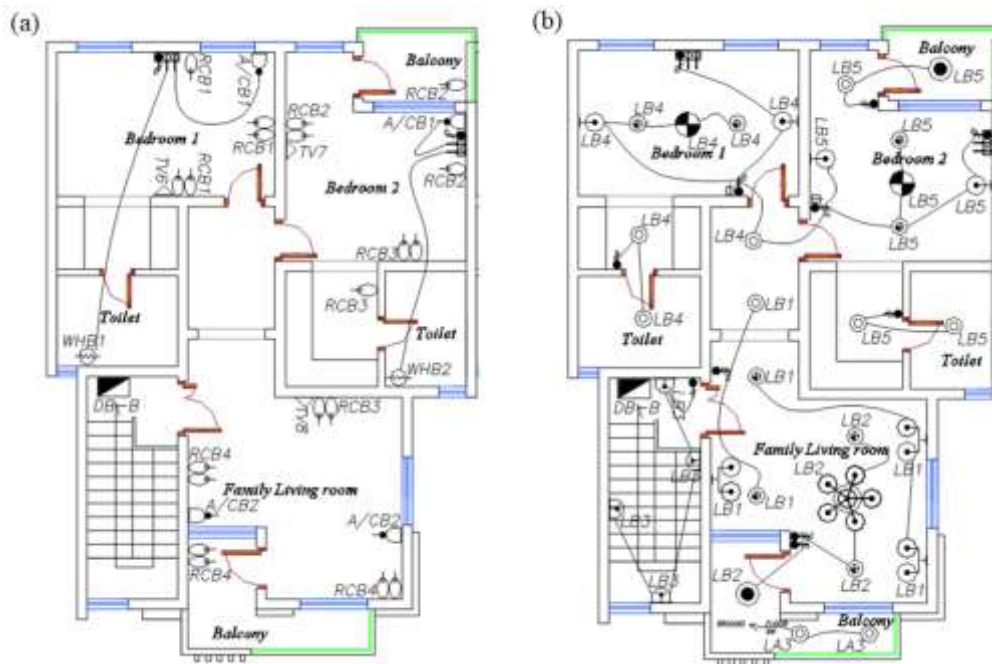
Electrical Layout of (a) PowerPoint and (b) Lighting Point on First Floor
